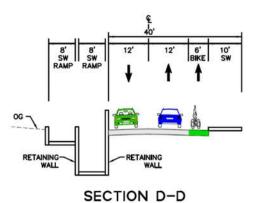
(cont.): Sunnyvale Avenue Underpass Tunnel Alternative (Cross-Sections)
